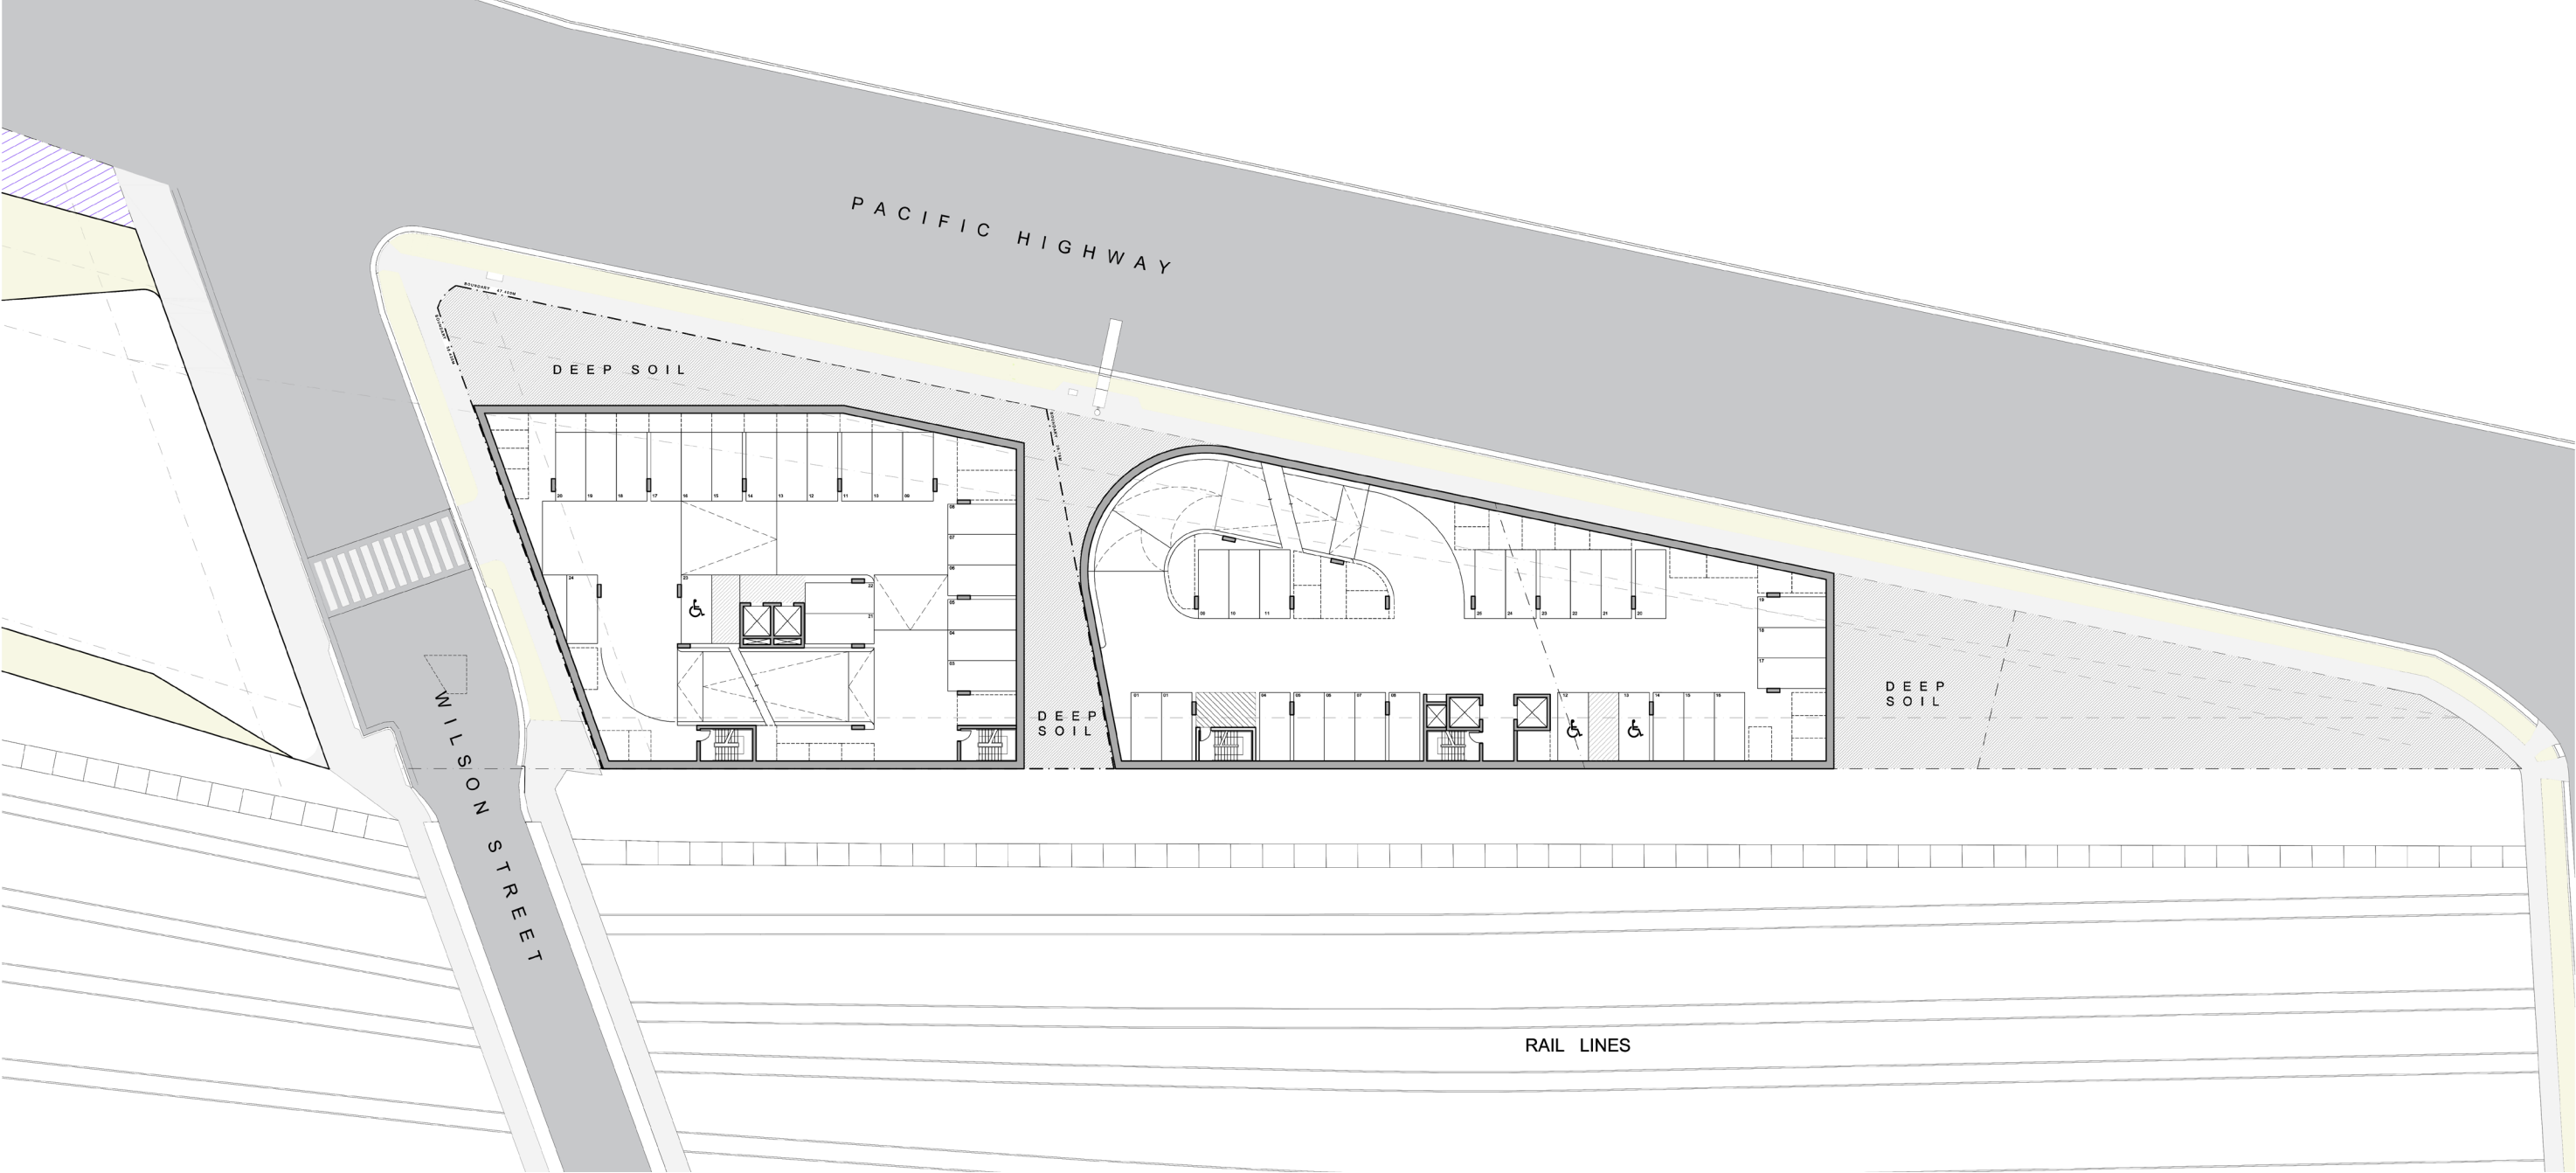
Indicative plan for subject site and potential future development of Service Station Site
